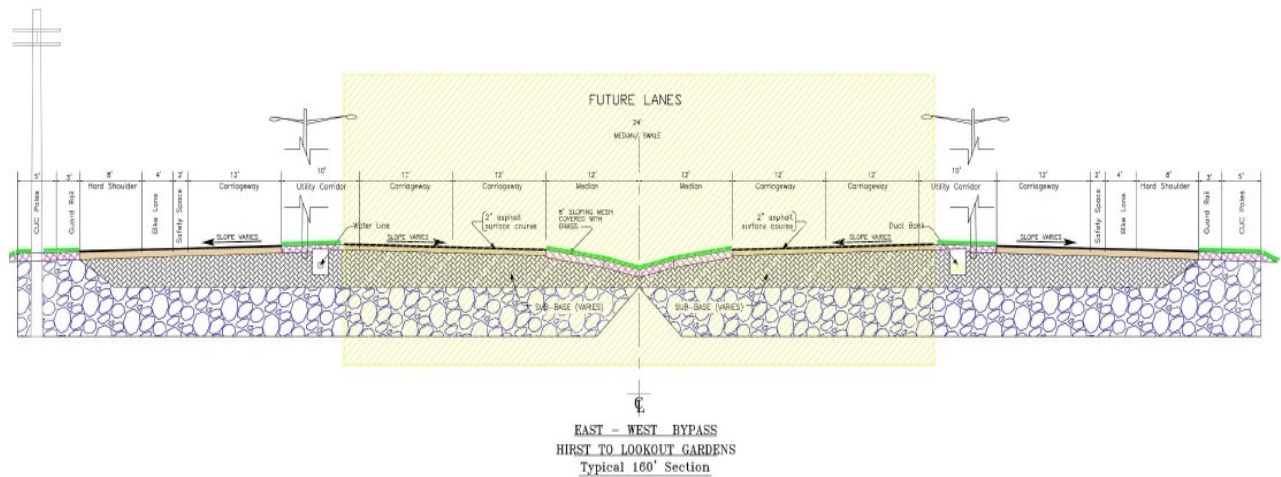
Original EWA Extension typical section proposed between Hurst Road and Lookout Gardens
